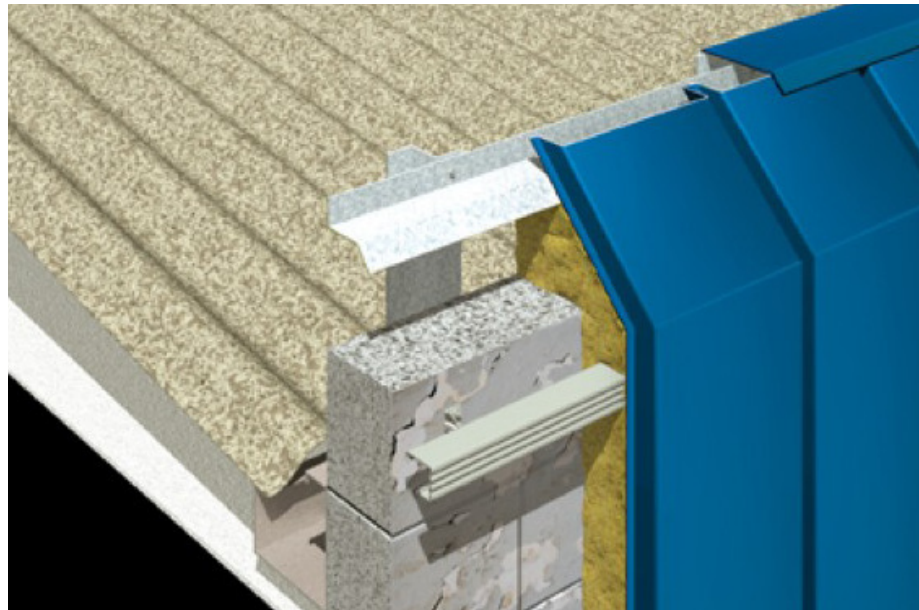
Pre-finished steel flat profile and trapezoidal profile over cladding wall systems
